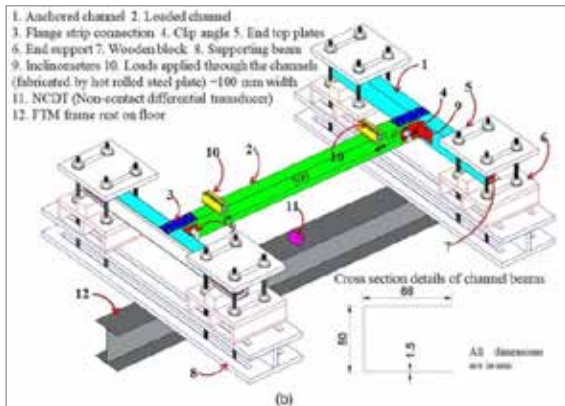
CFS beam-to-beam connection with clip-angle and flange-strip
